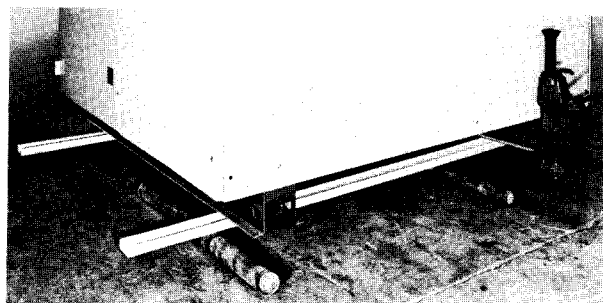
Jacks Removed and Switchgear Ready for Lateral Moving
